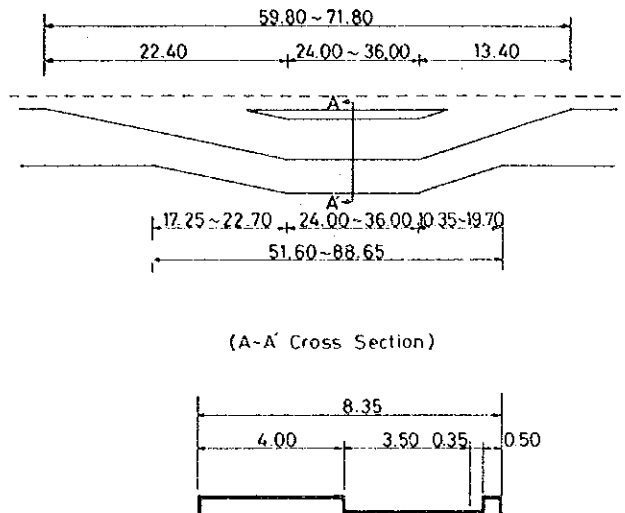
STANDARD CROSS SECTION OF BUS BAYS
